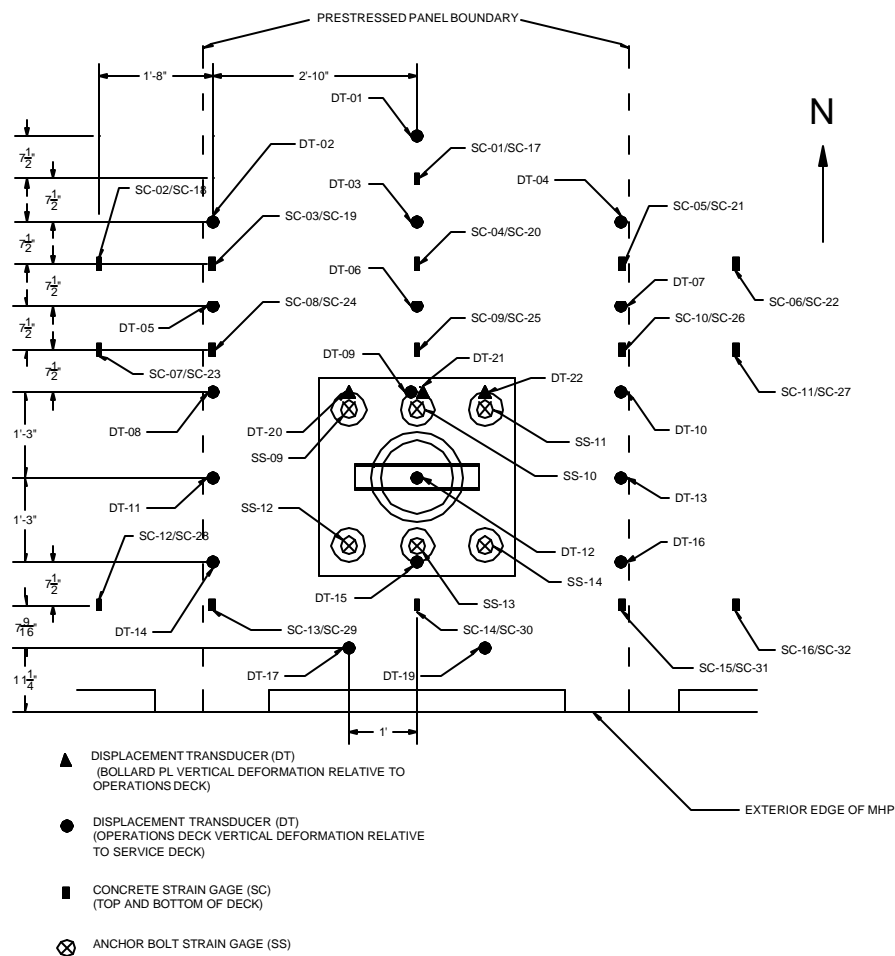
Deck and Bollard Instrumentation Plan - Plan View
